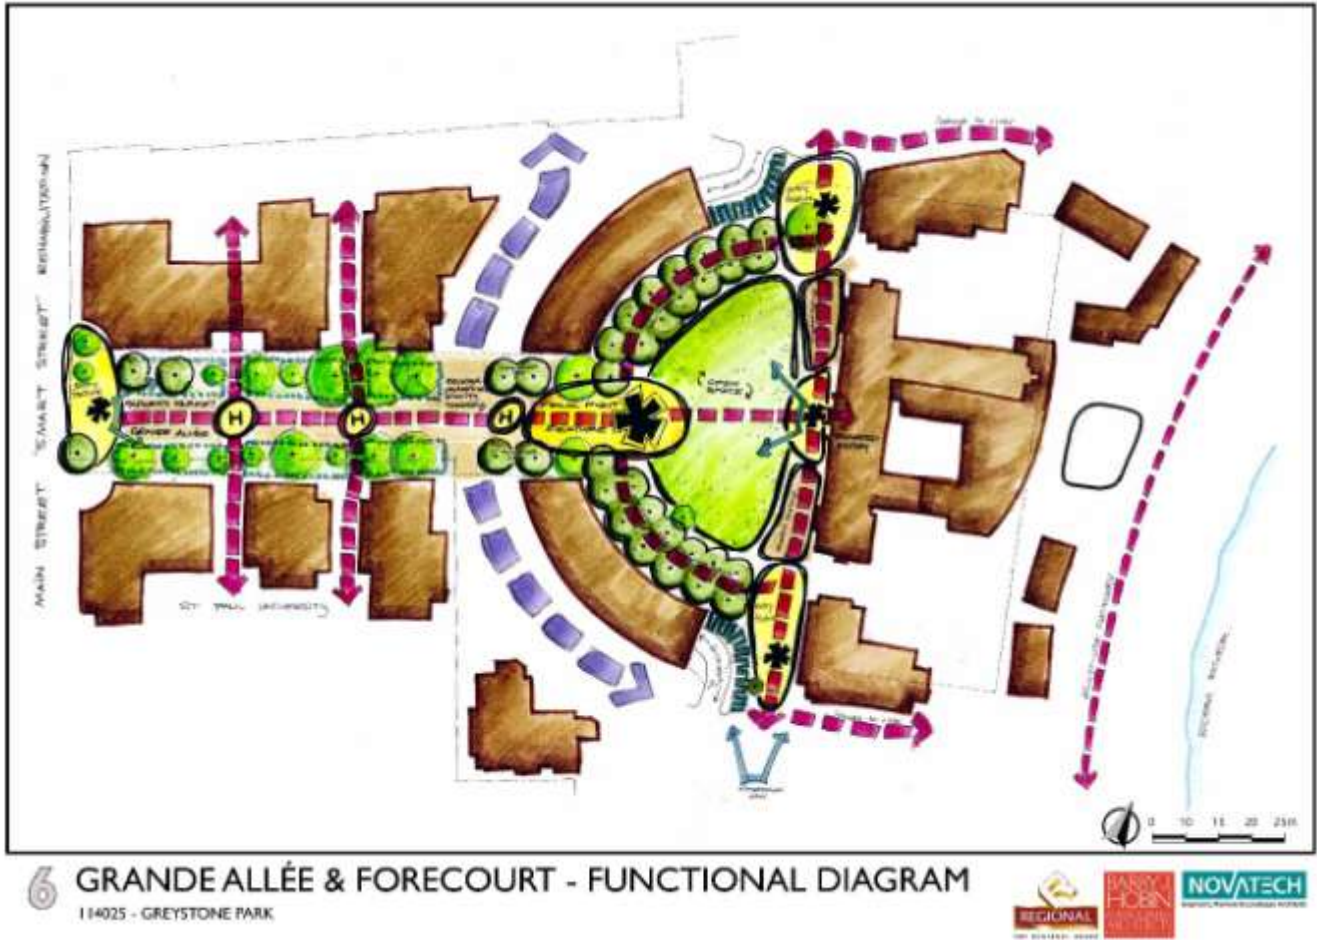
Landscape concept sketch of the Grande Allée to the Deschâtelets Building. Credit: Novatech
